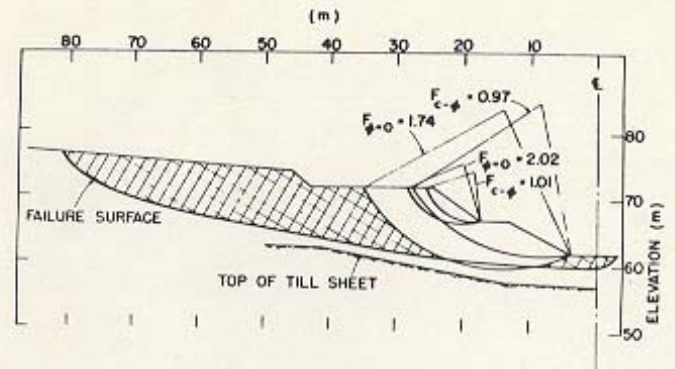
Cross-section of November 3, 1965 failure at station 52 + 70 on the lower canal
